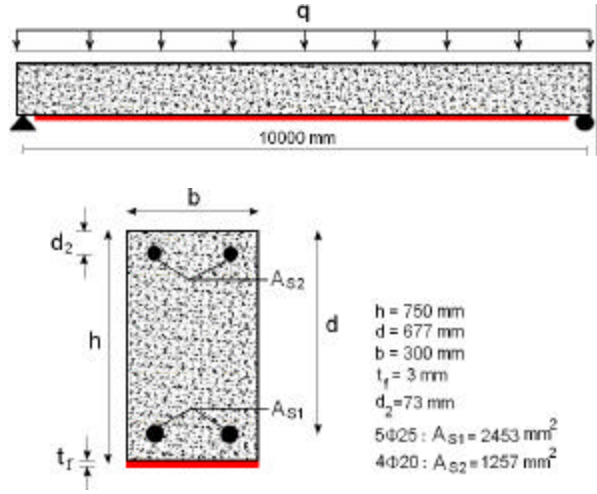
Details of FRP-strengthened reinforced concrete beam in numerical analysis
